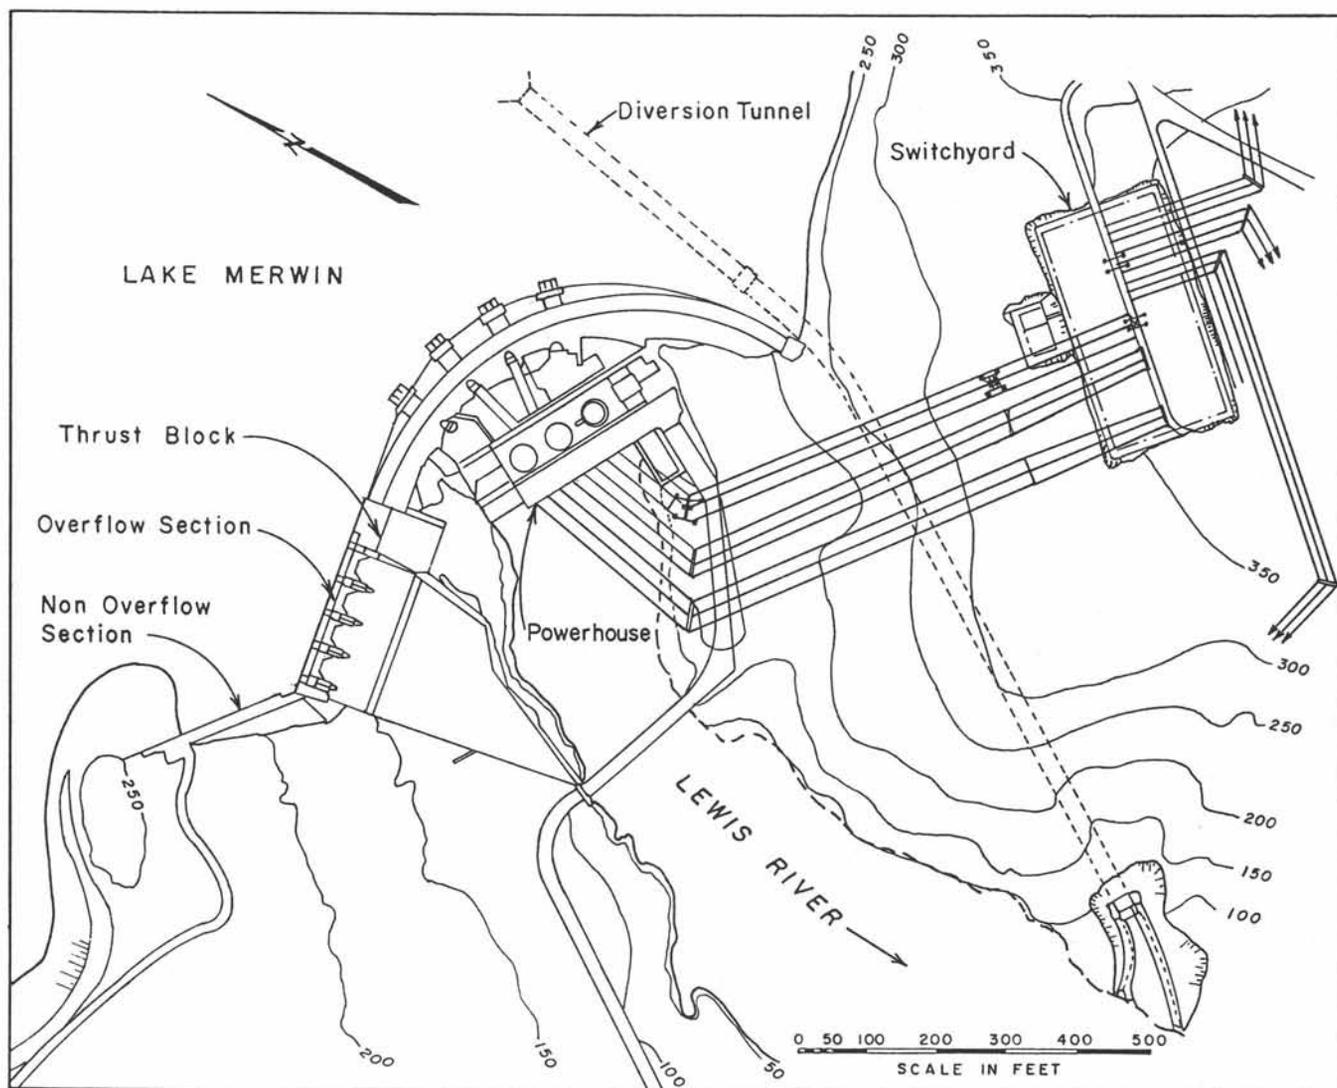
General plan of structures at Merwin Dam. From Tilford and Sullivan (1981).
